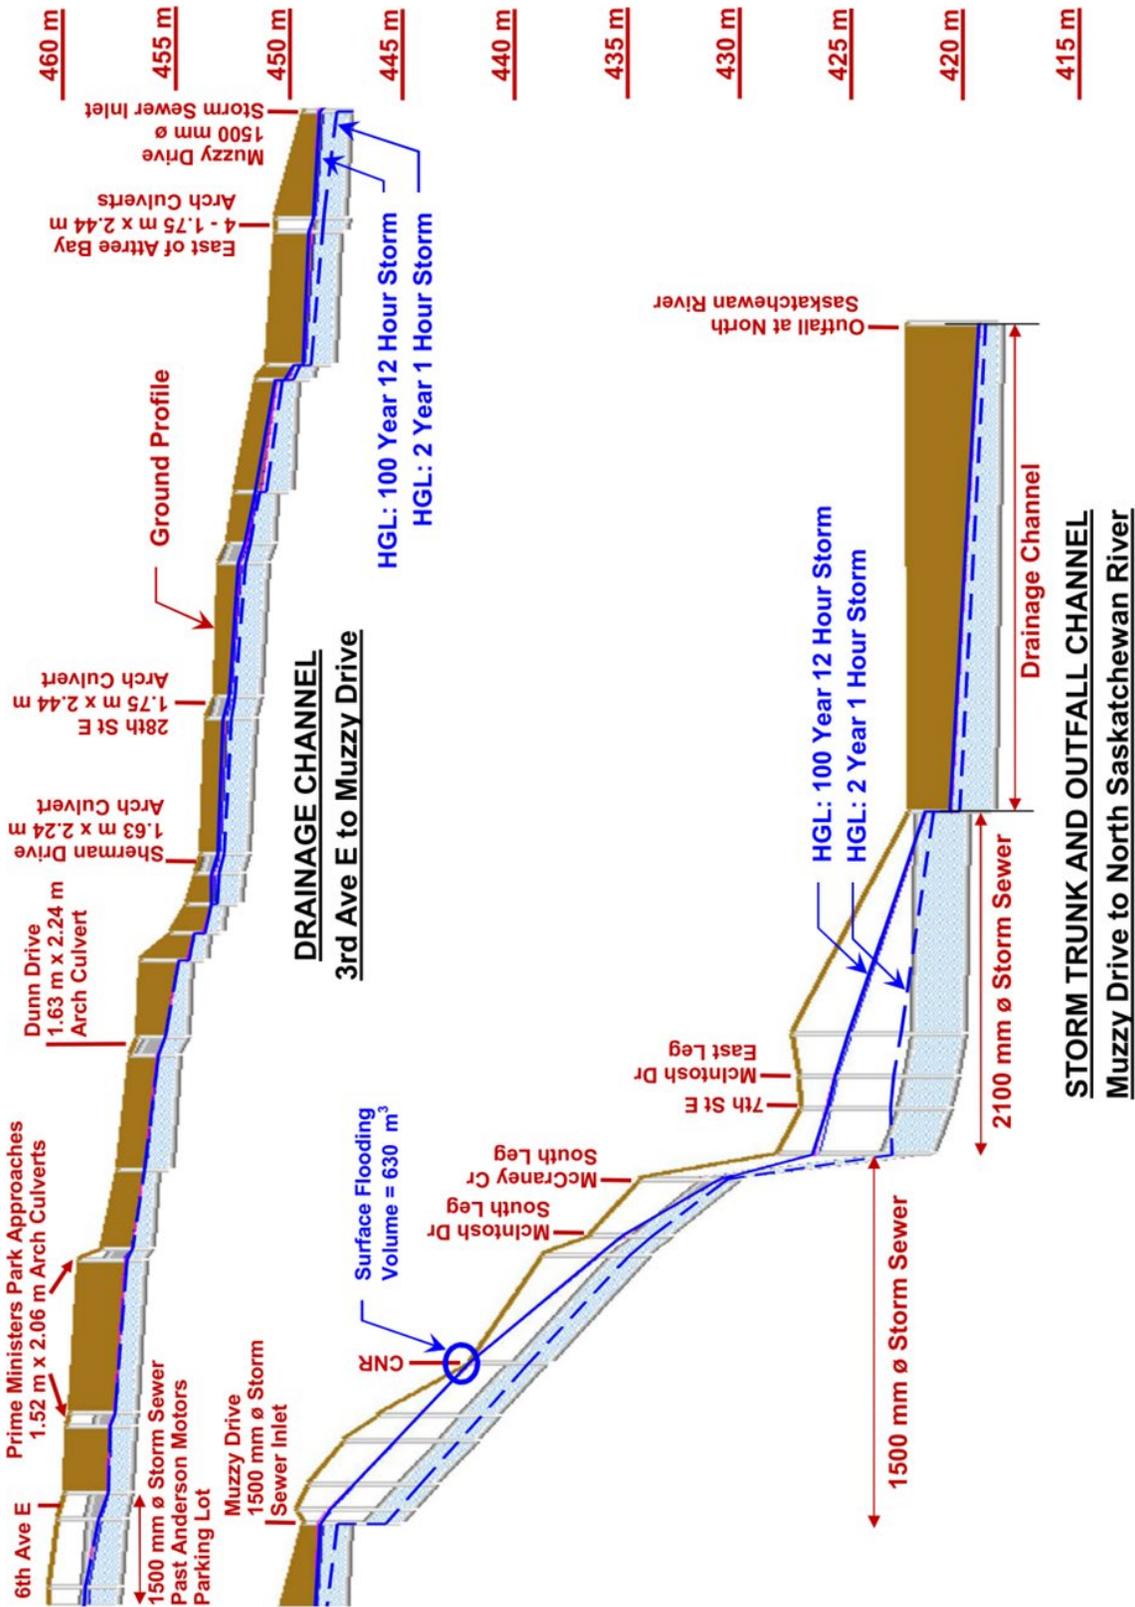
Drainage Ditch and Storm Trunk - 3rd Avenue East to Outfall at North Saskatchewan River
